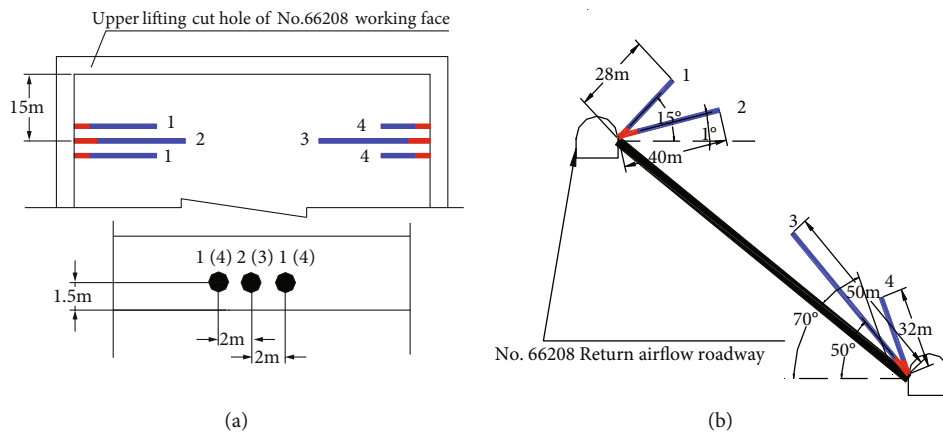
1st set of blasting hole layout. (a) Plane view and (b) section view.
